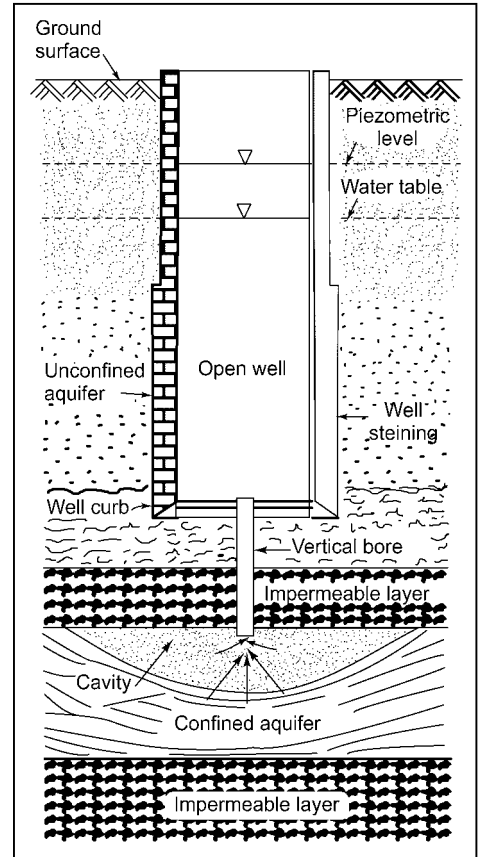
Sectional view of an open well with a bore at the bottom ending in a cavity
